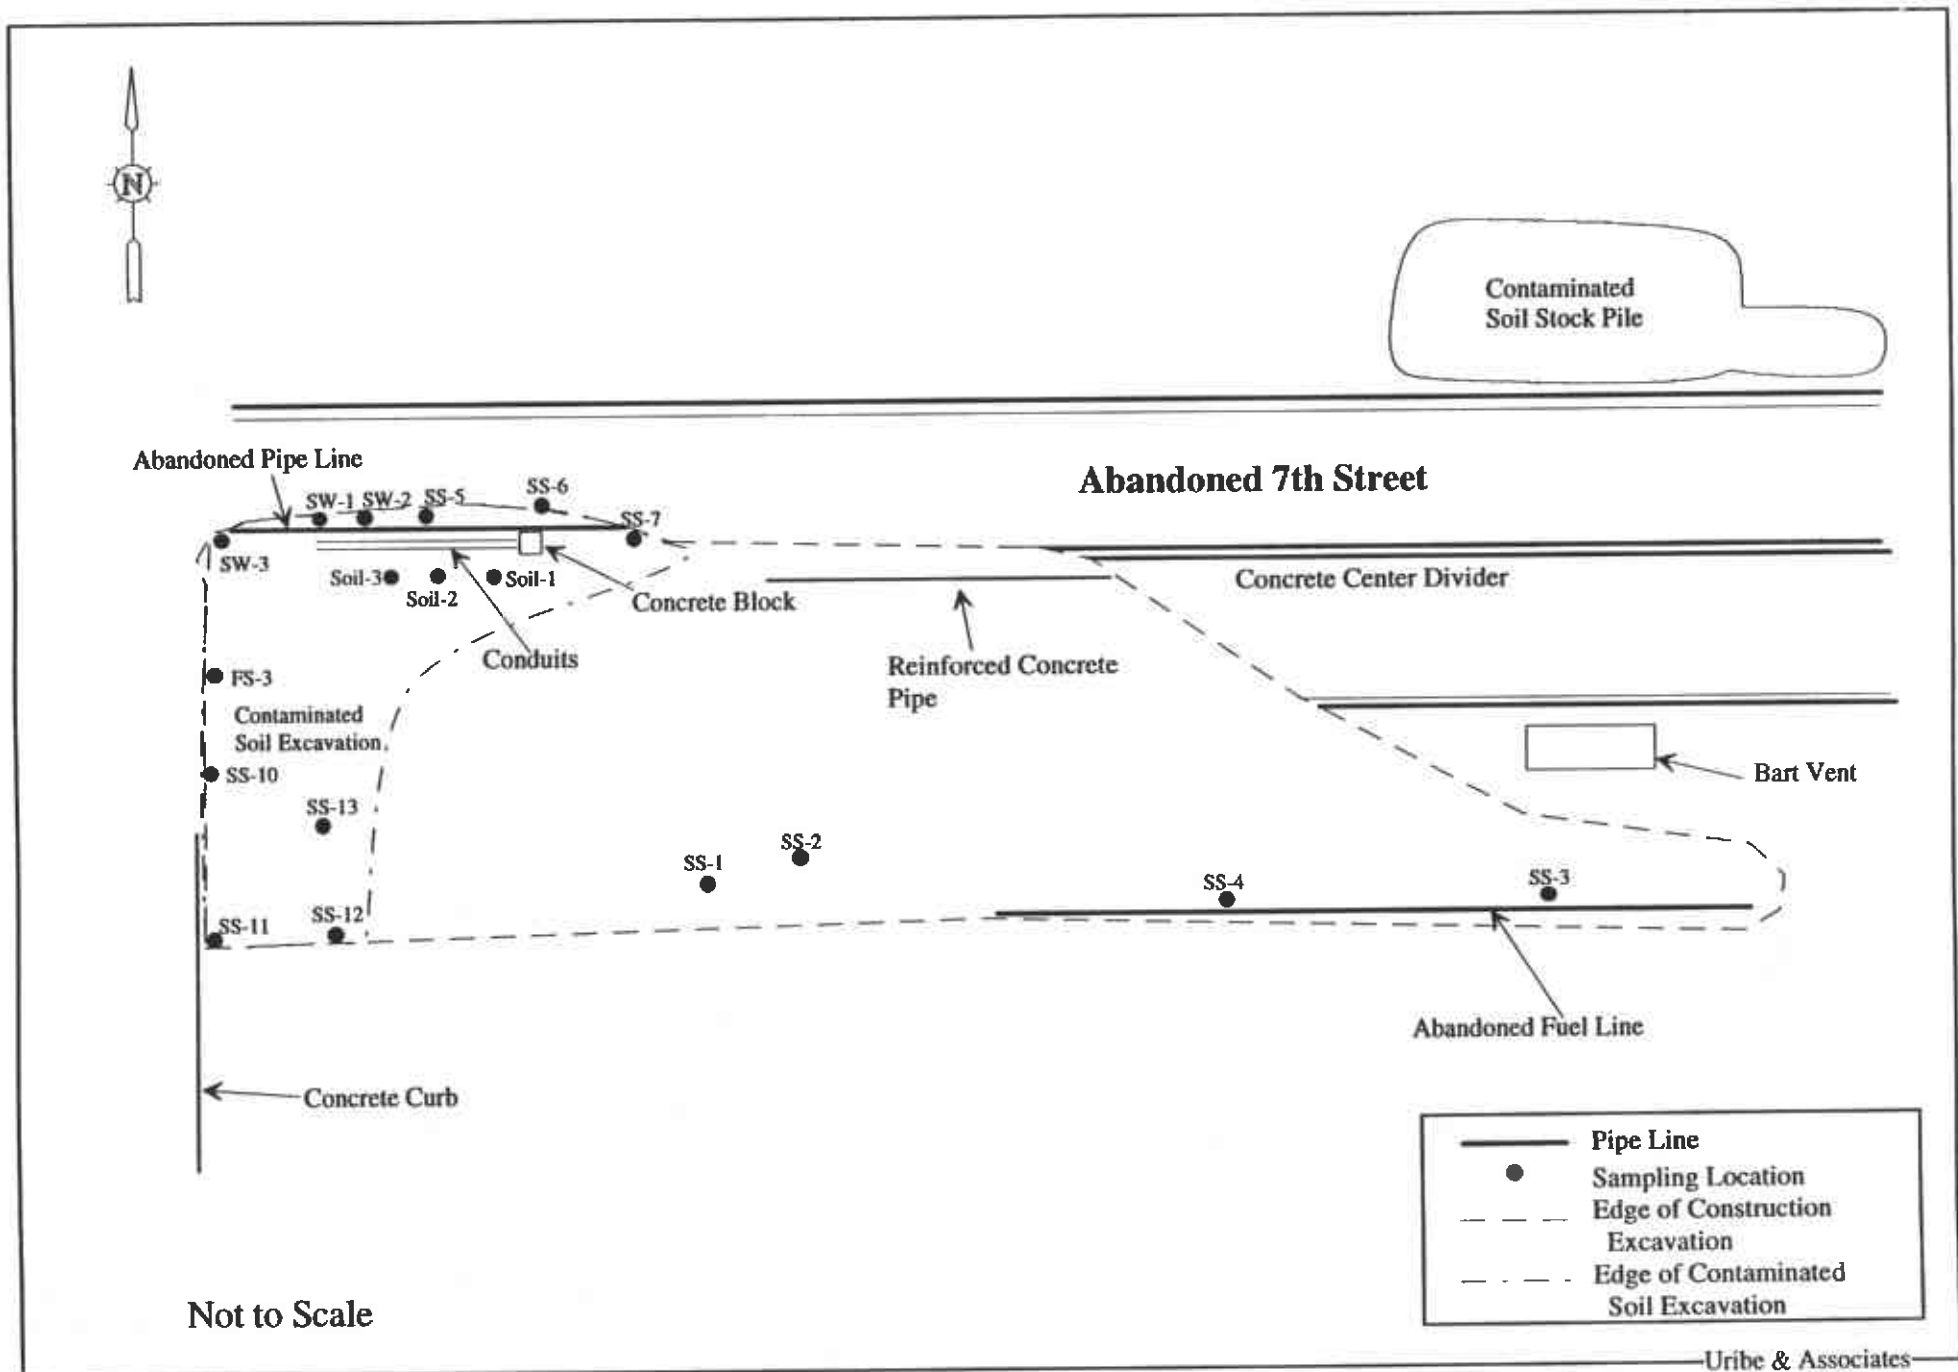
Site Plan with Sampling Locations and Extent of Excavation
